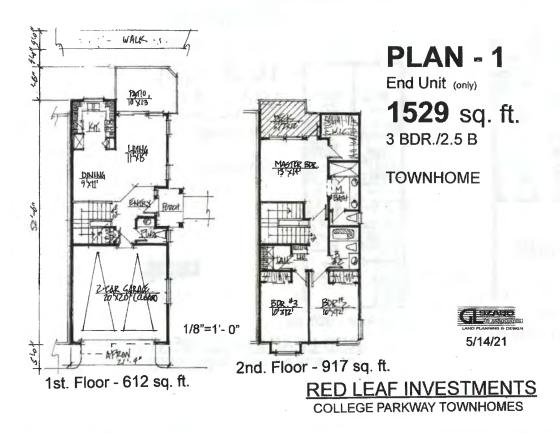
Proposed Building Elevations and Floor Plans (continued)
